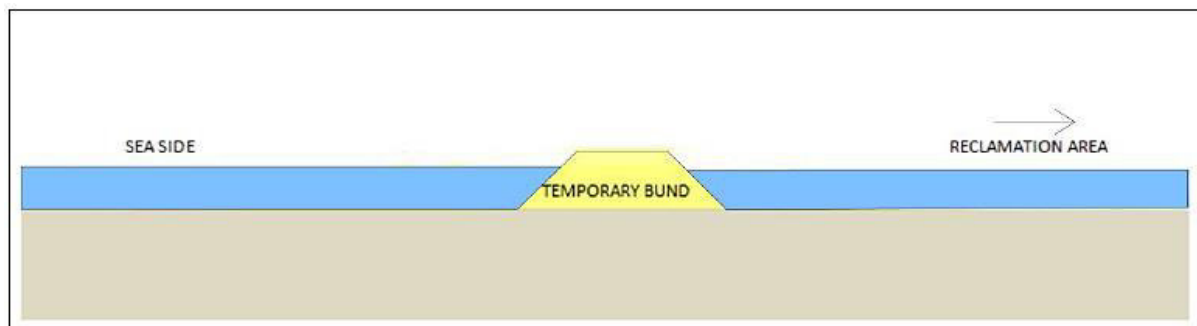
Cross Section of Proposed Temporary Containment Bund
